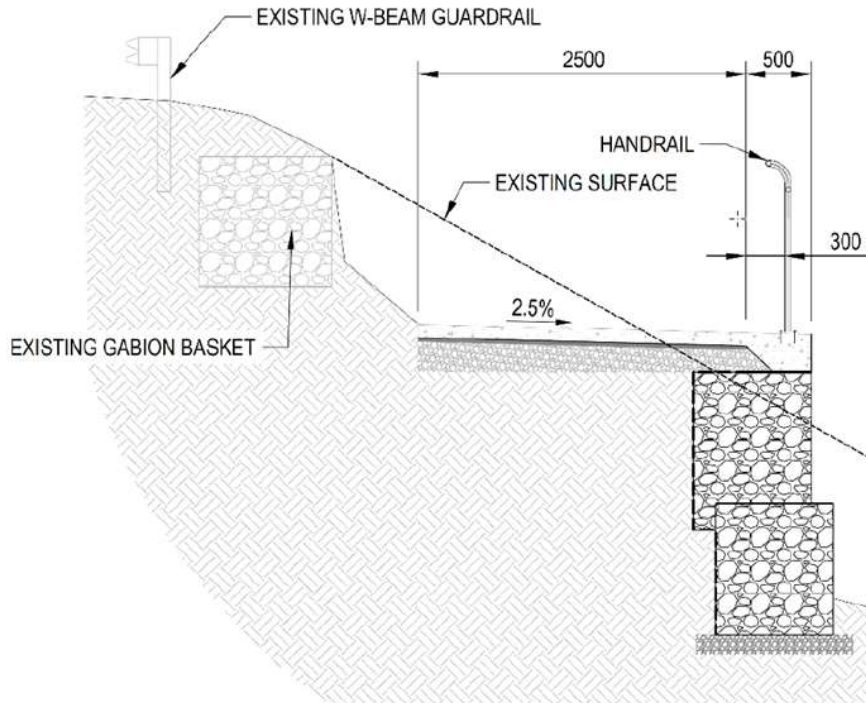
Typical cross-section where there is no verge and existing wall behind guardrail (from fishing platform to southern extent of Stage 1 works)
